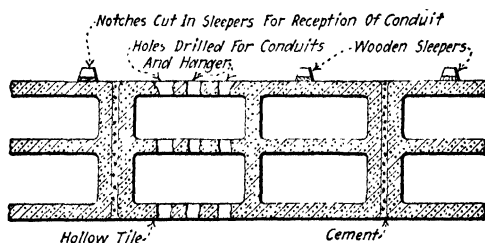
Installing a ceiling-fixture outlet box in a hollow-tile floor slab in a building under construction. First step, holes made through the tile.
